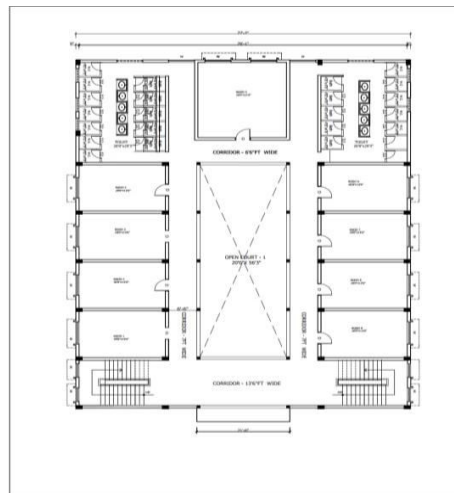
Typical Floor Plan(First Floor To Fifth Floor)
